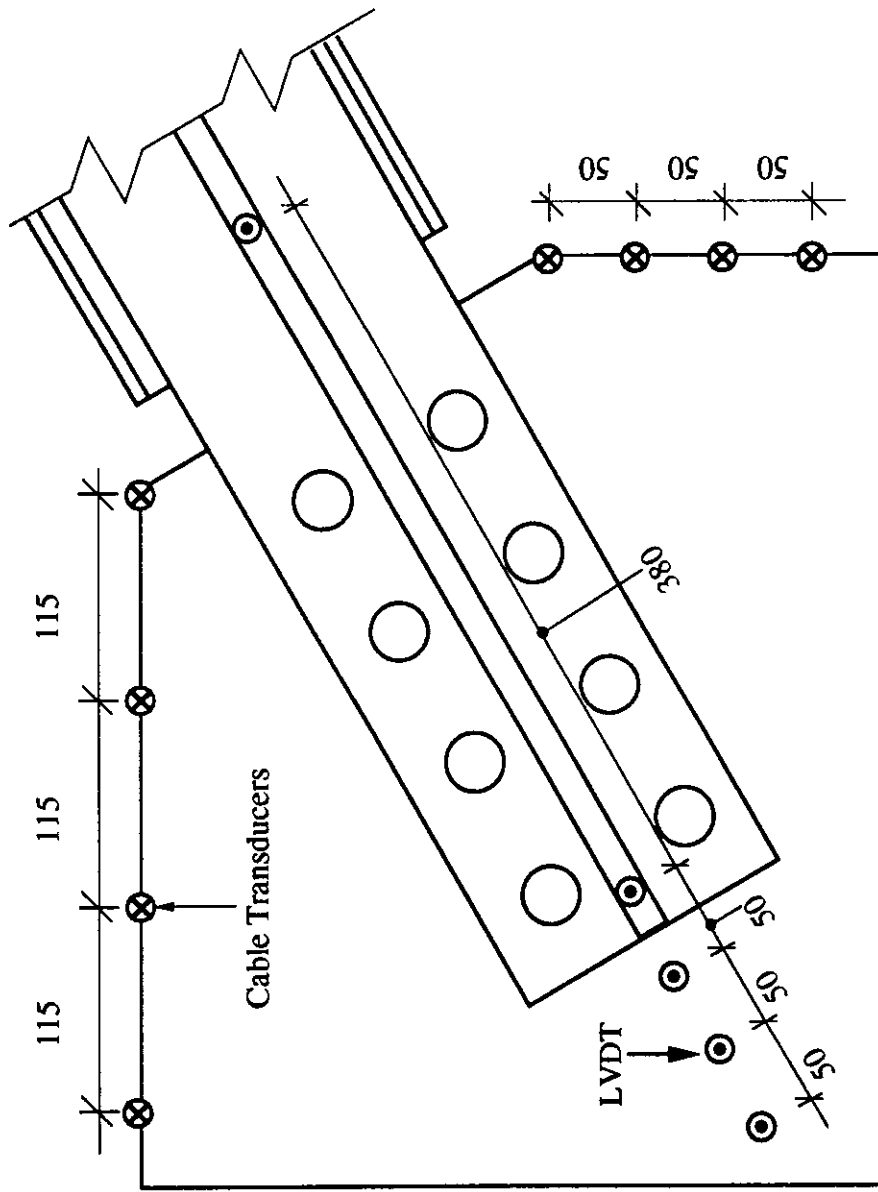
Schematic of Cable Transducers and LVDTs Location for AP Type Specimens
